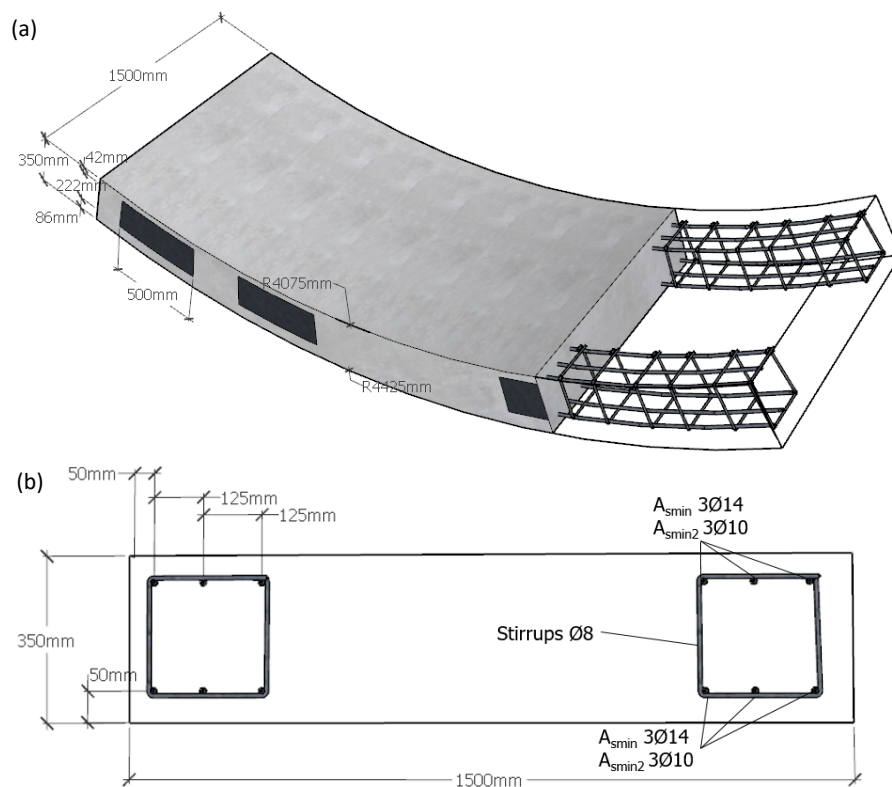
Geometrical properties of the segment (a) general layout and (b) cross section and reinforcement distribution
